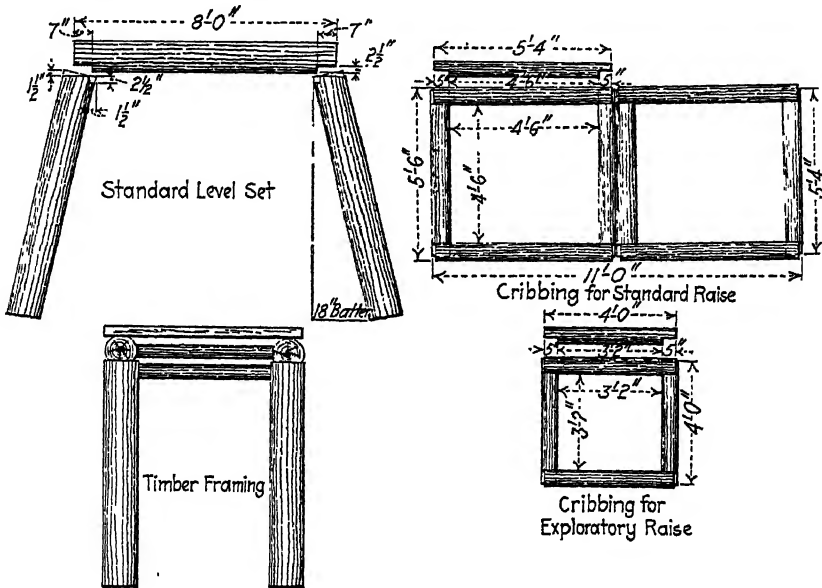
DETAILS OF TIMBER FRAMING USED BY CLEVELAND-CLIFFS IRON CO.
